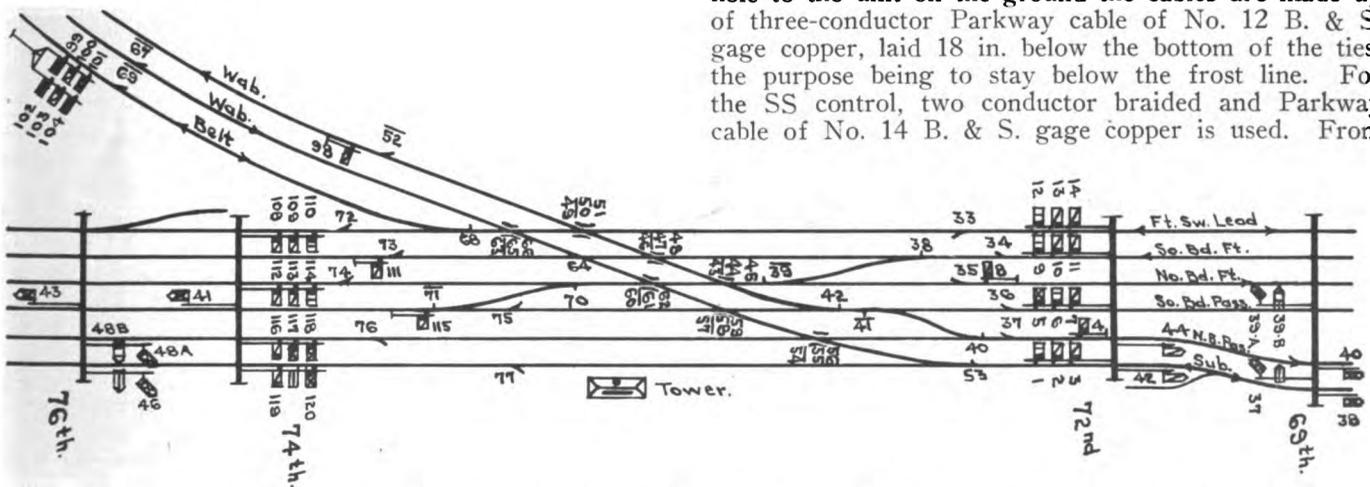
Track and Signaling Plan of New Electric Interlocking at 74th Street, Chicago, on the C. & W. I.
